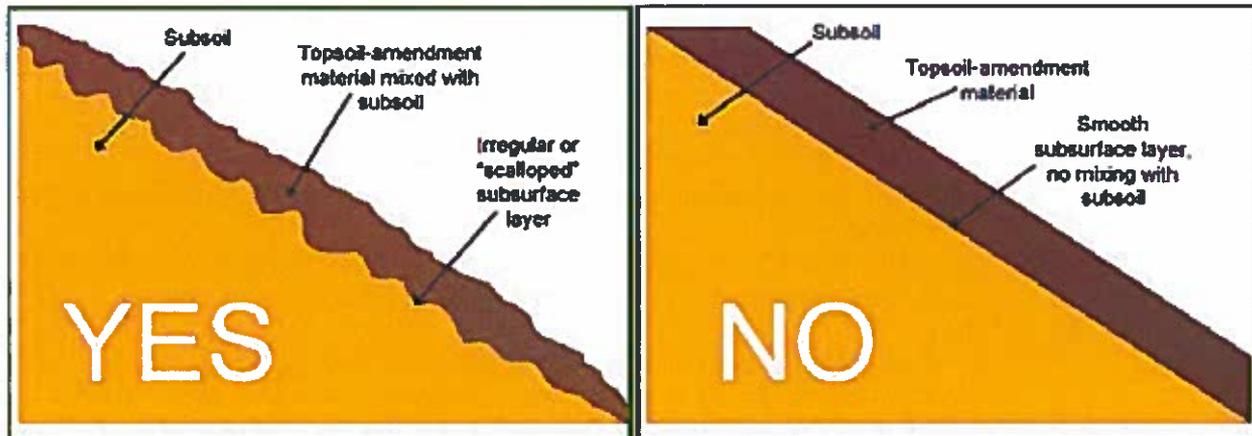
Topsoil amendment applied and mixed with subsoil, creating a scalloped subsurface layer (left). Typical topsoil amendment application without mixing with subsoil (right). Source: Watershed Management Guidebook (Drake & Hogan, 2013).<sup>1</sup>
